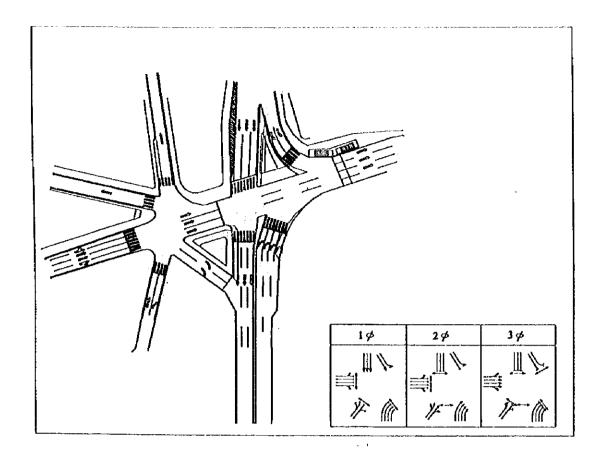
Intersection Improvement Plan - Arnous Square
